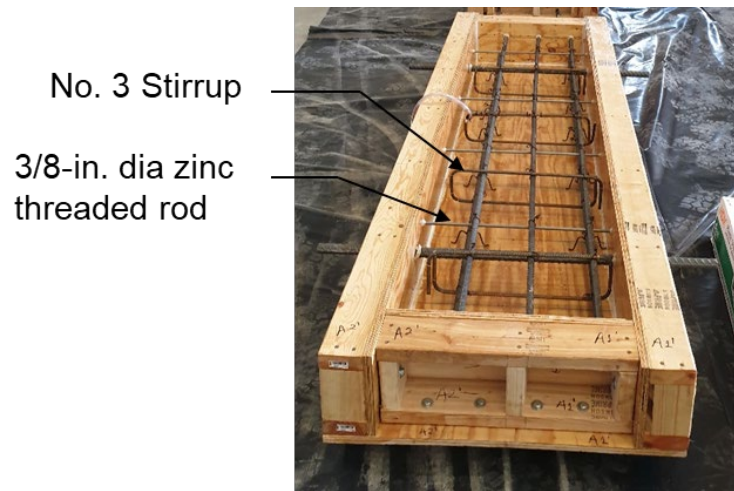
Reinforcing Steel Configuration in Side Panels
